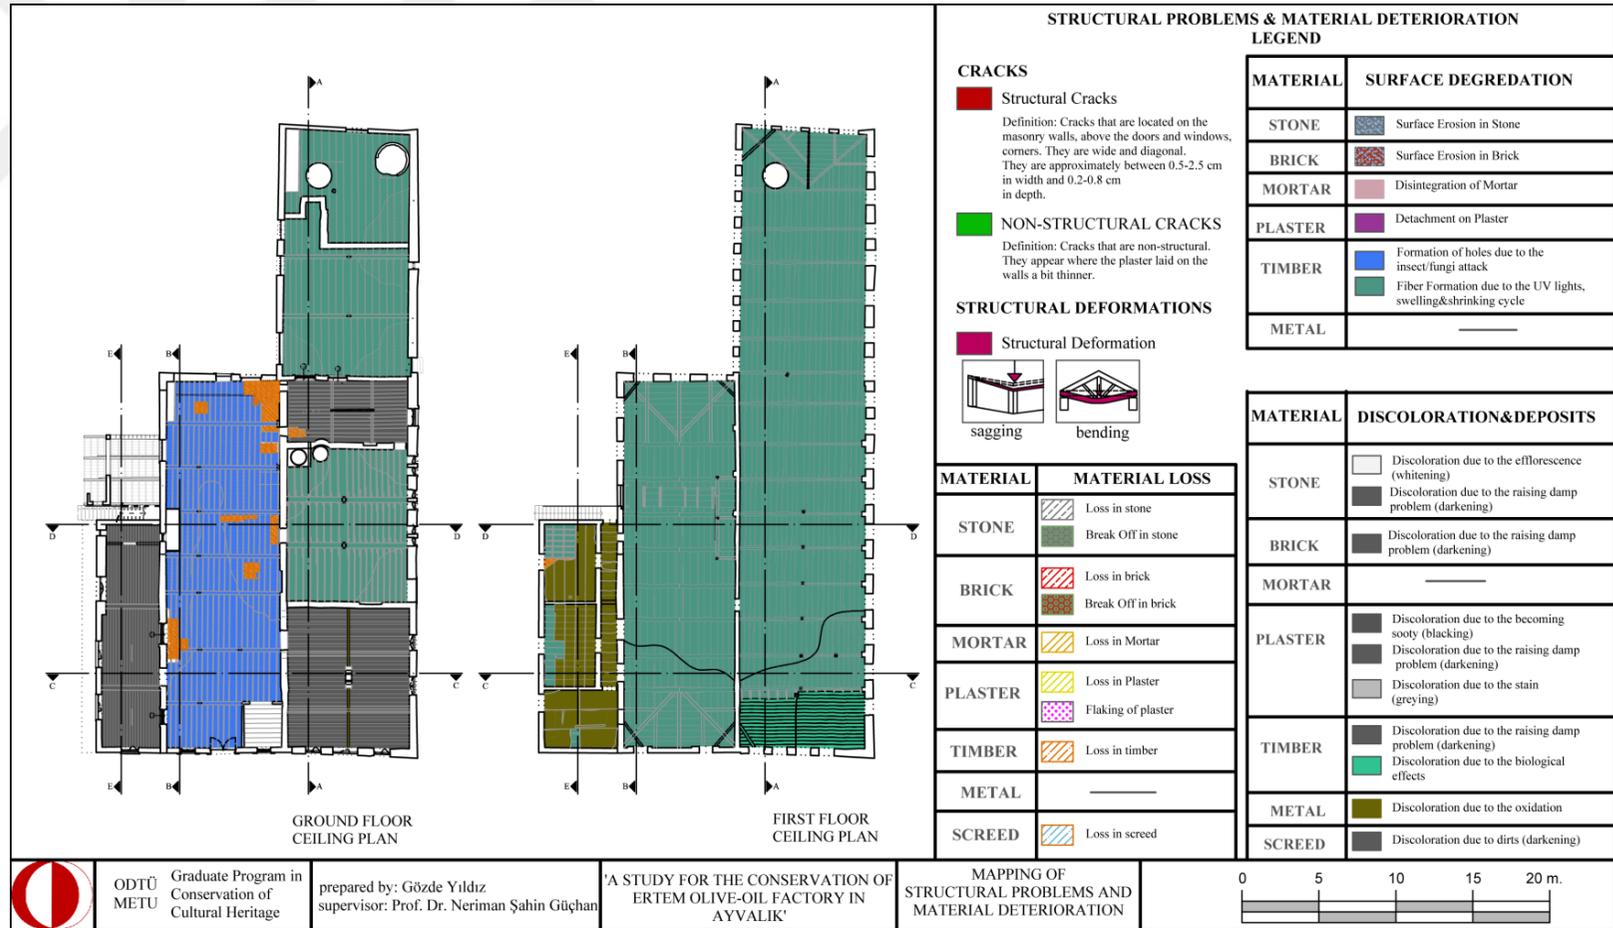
Mapping of structural problems and material deteriorations, ceiling plans
